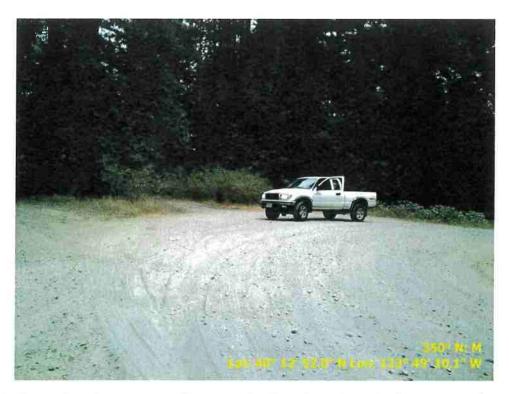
Photo of Road Point 14 which is a good pullout that will need to be maintained as a pullout.
